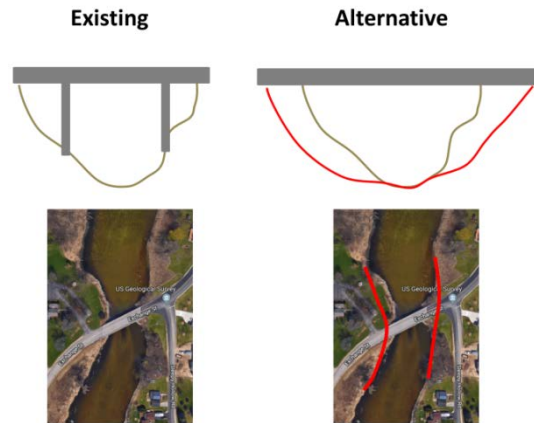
Existing (brown line) and after cross section in brown and widened to the new cross section in red.
